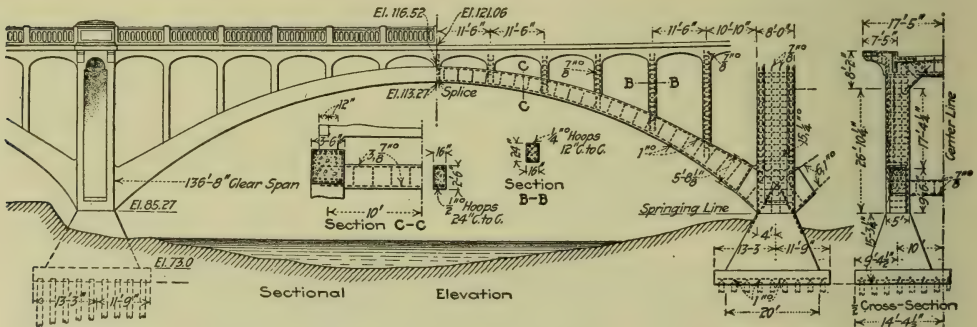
A Reinforced Concrete Arch Span for a Country Road
